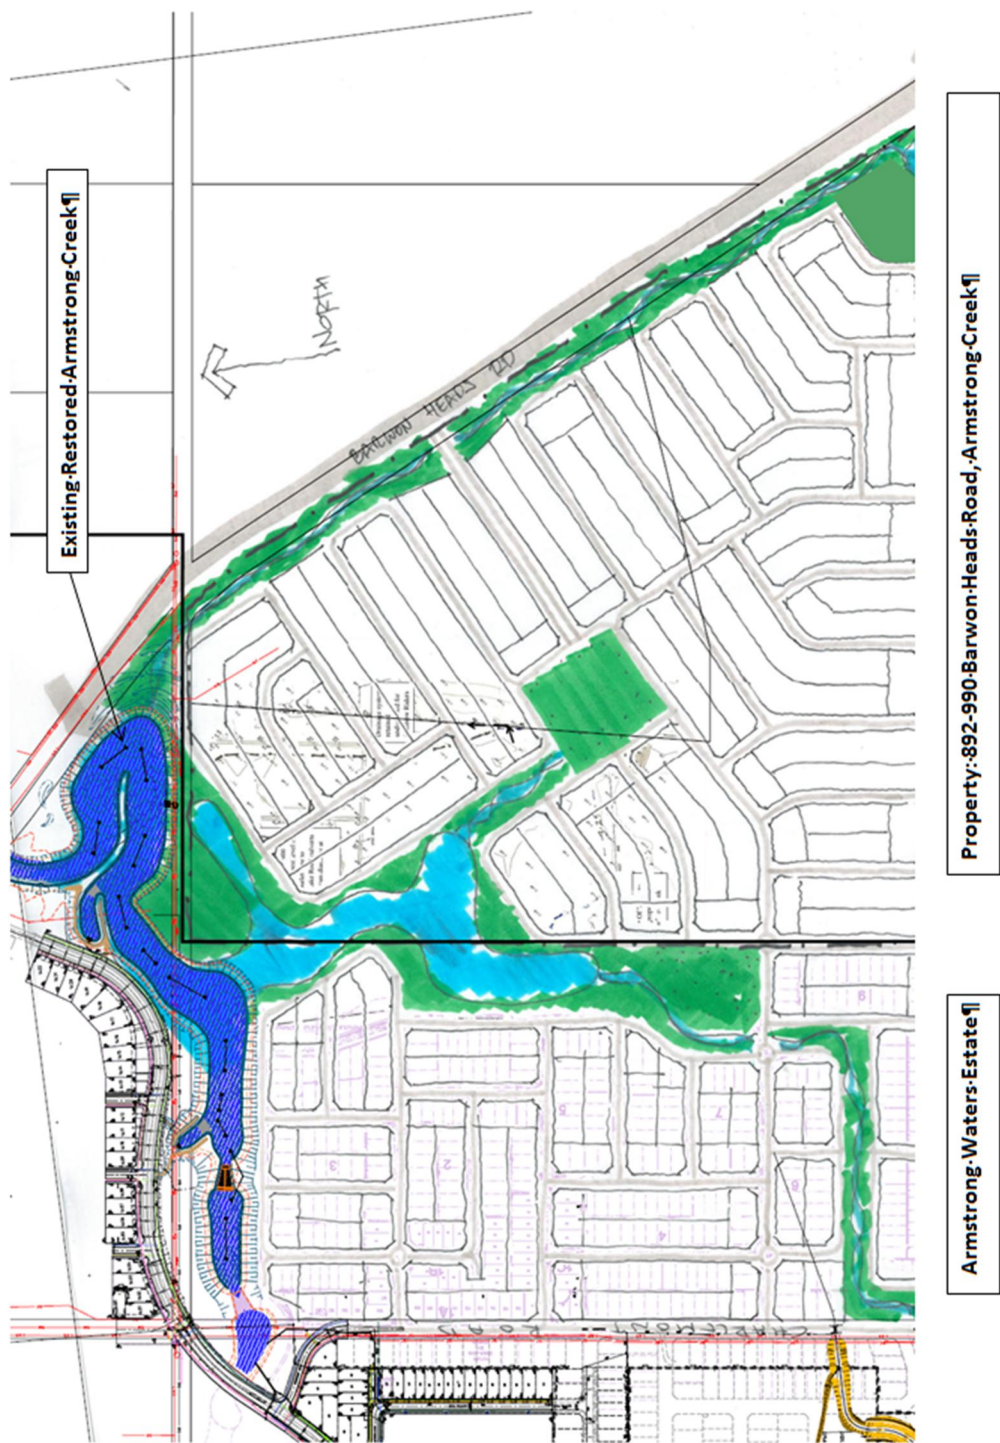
Proposed Site Drainage including Armstrong Waters Concept and Proposed Drainage Features (Floodway/Integrated Waterways)
